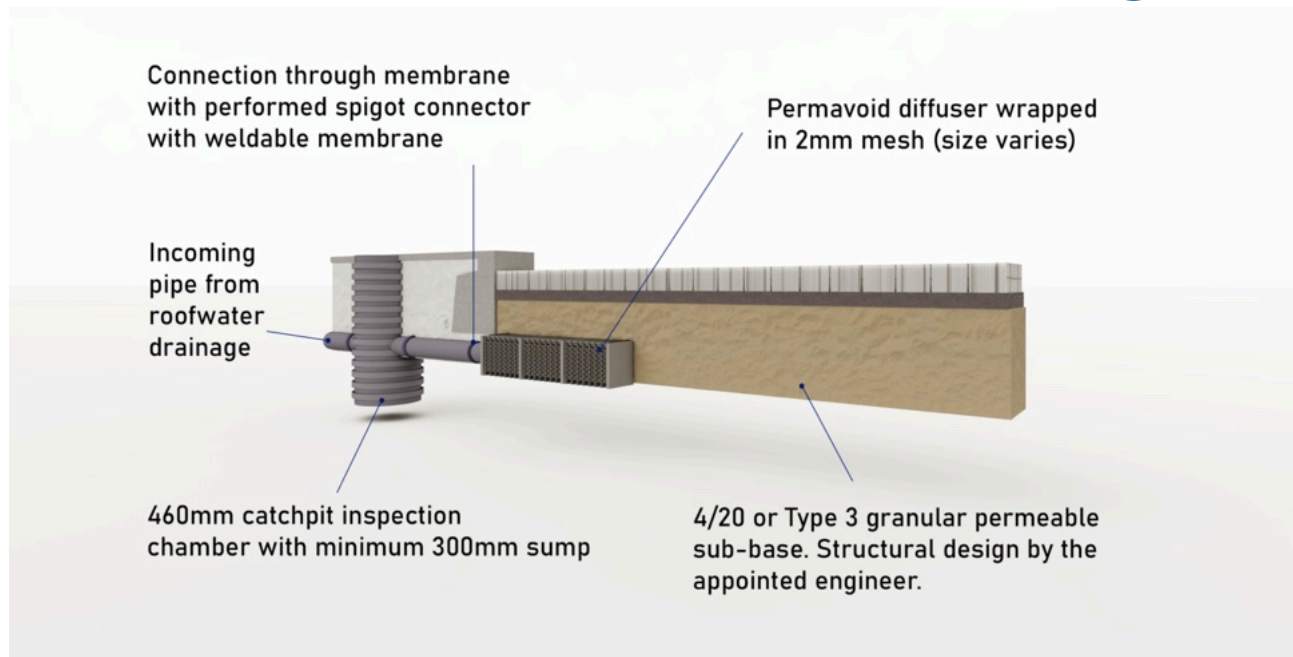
TYPICAL DIFFUSER UNIT DETAIL
